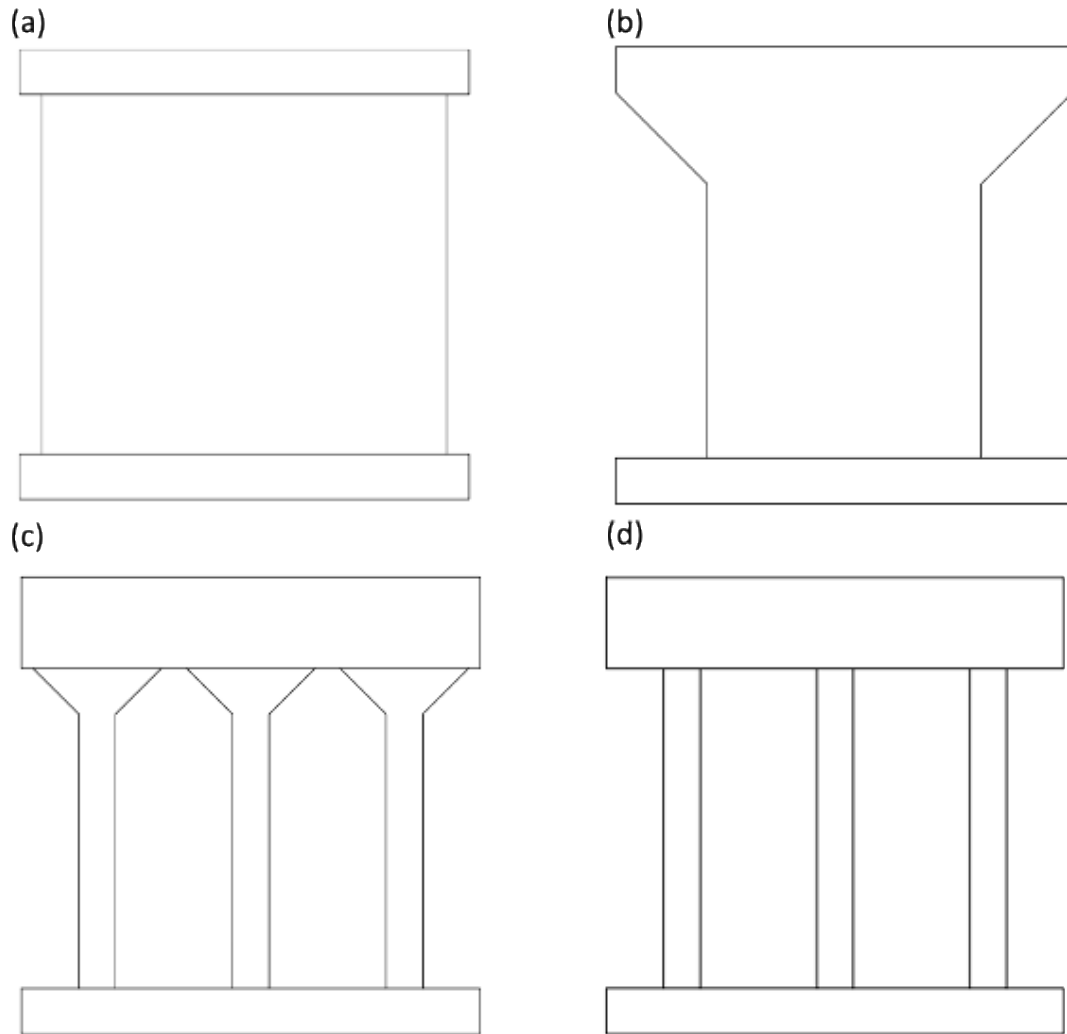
Elevation Schematic of (a) Walls, (b) Hammerhead Walls, (c) Frame Bents with a Capital, and (d) Frame Bents without a Capital
